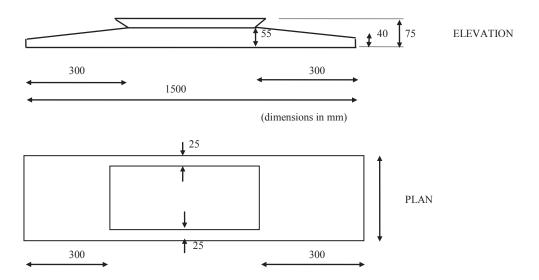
Pre-cast slab panel used for the reinforced concrete composite slab system
